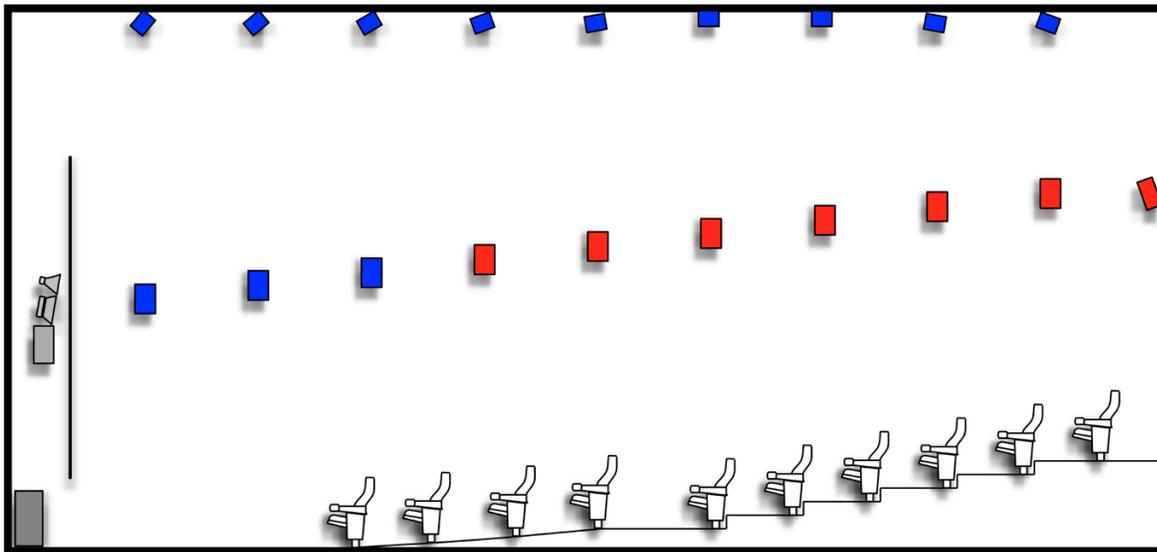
Recommended Side Wall and Ceiling Speaker Locations
